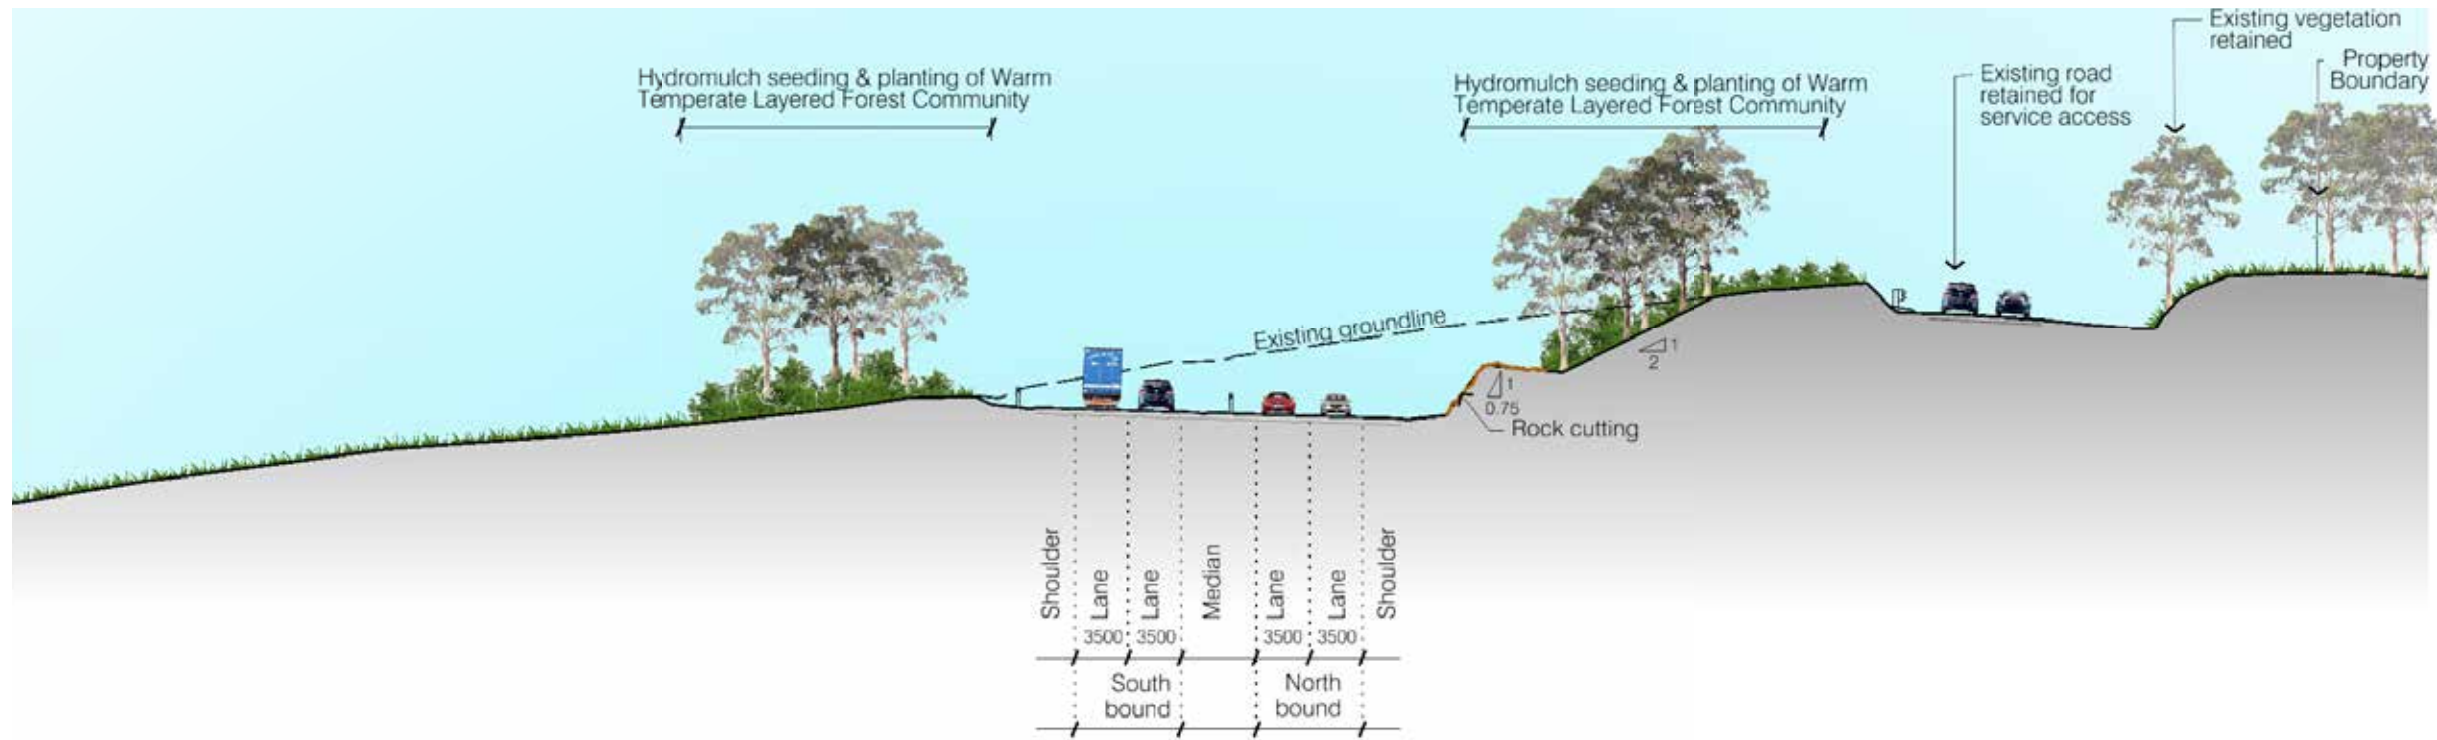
Road cross section at Ch.11600 (Scale 1:500 @ A3)
